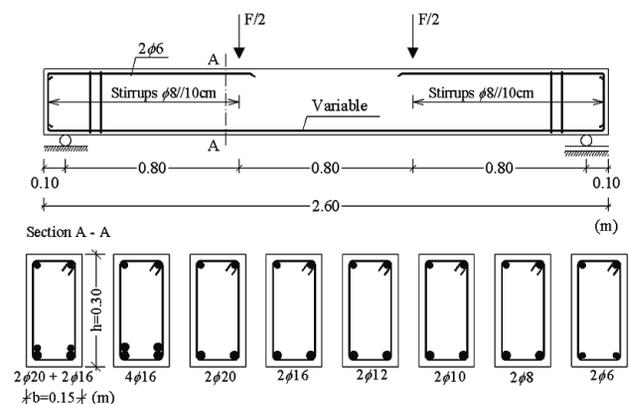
Geometry and details of test beams (Bernardo *et al.* 2014)
